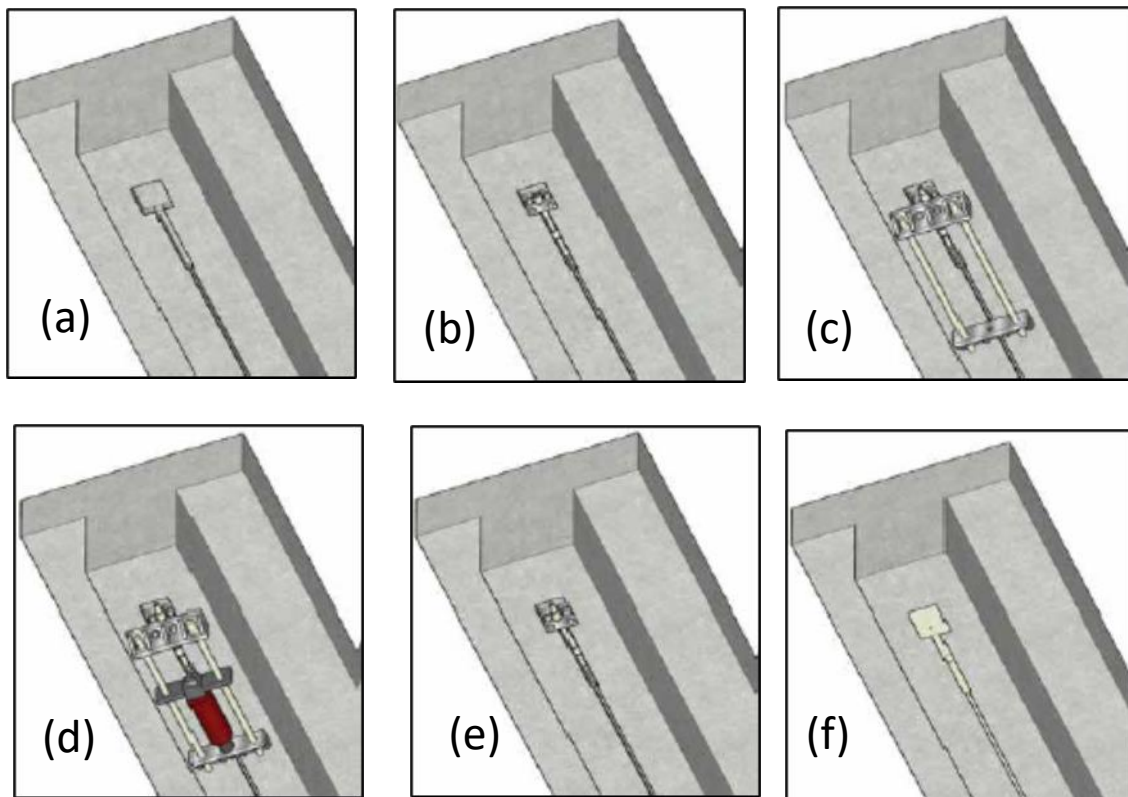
Strengthening scheme: (a) groove and anchorage zone are cut into the girder; (b) anchorage and CFRP rod are installed; (c) jacking apparatus is mounted; (d) post-tensioning force is applied to anchorage sleeve on the CFRP rod; (e) force is transferred from the jacking apparatus to a fastening nut on the end of the anchorage sleeve; and (f) the groove and anchorage zones are grouted.
